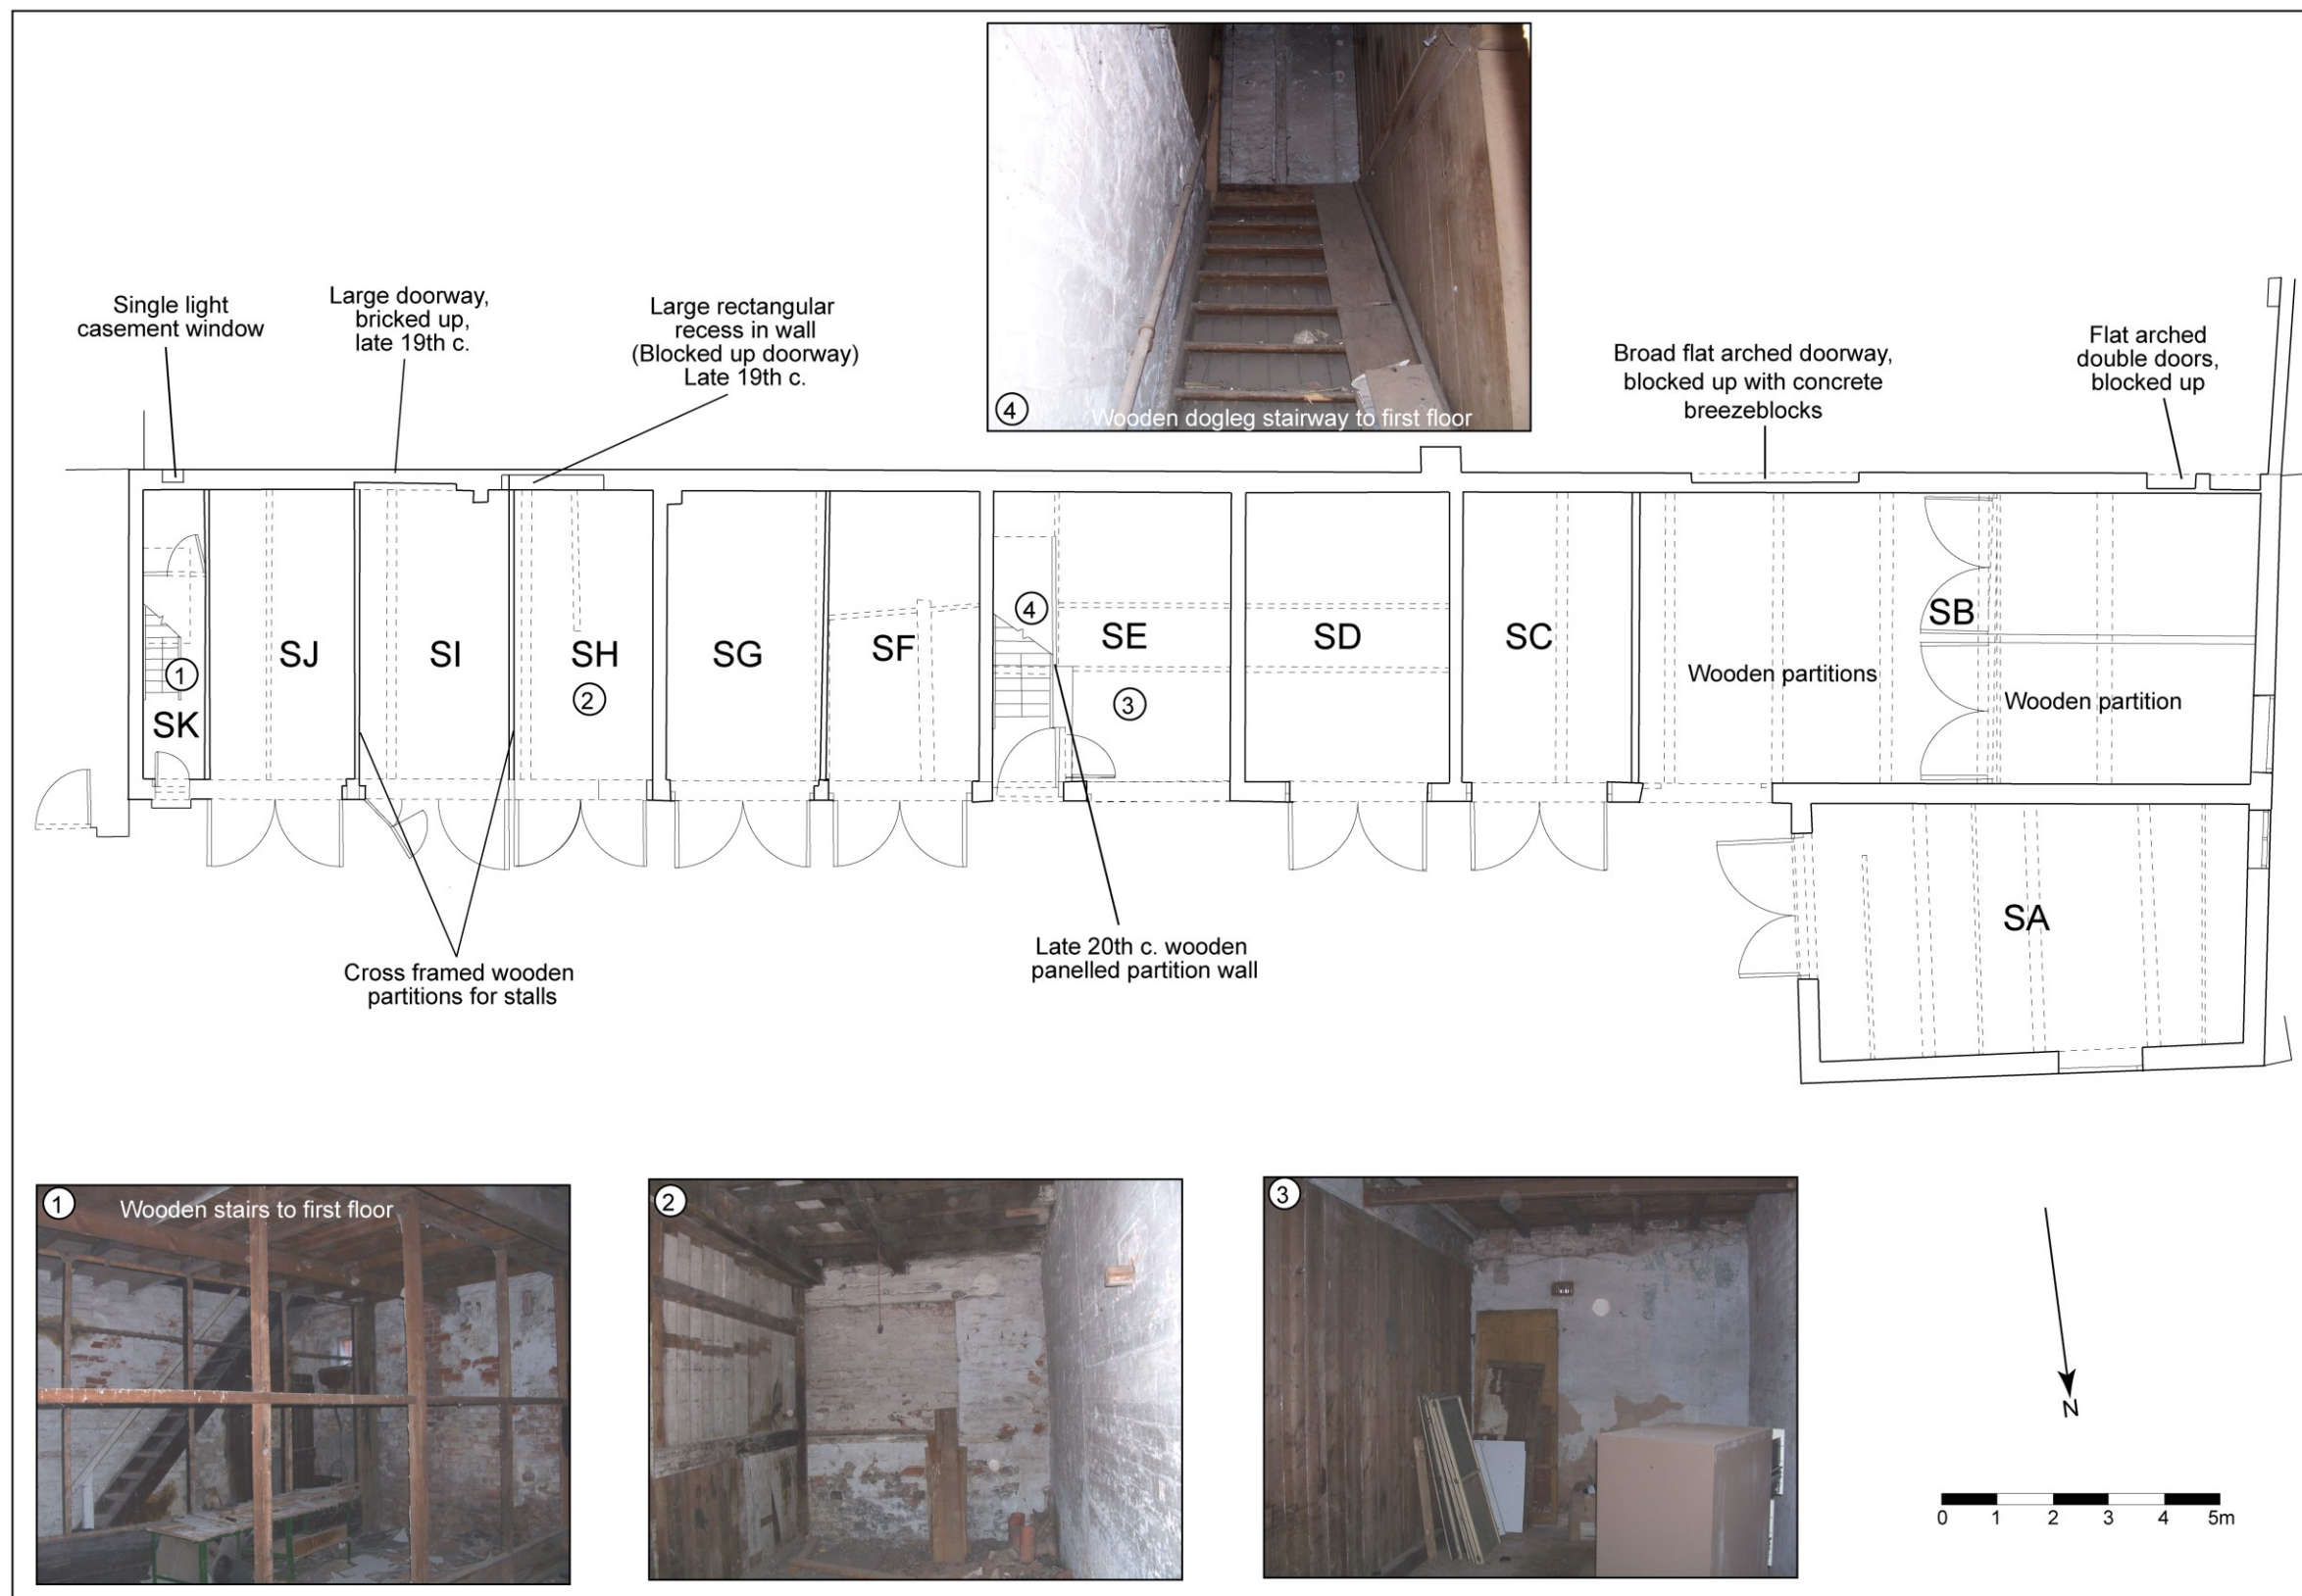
Ground-floor plan of outbuildings to rear of No. 38 South Street
